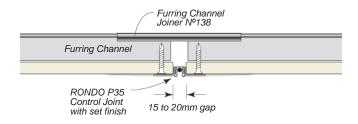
CONTROL JOINT DETAILS FOR NON FIRE RATED CEILING
